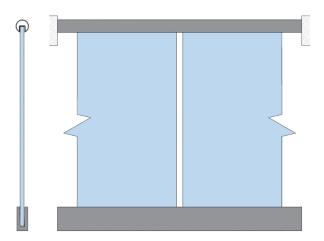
System  $\gamma$ : Version with continuous handrail and lateral end connection of the handrail
